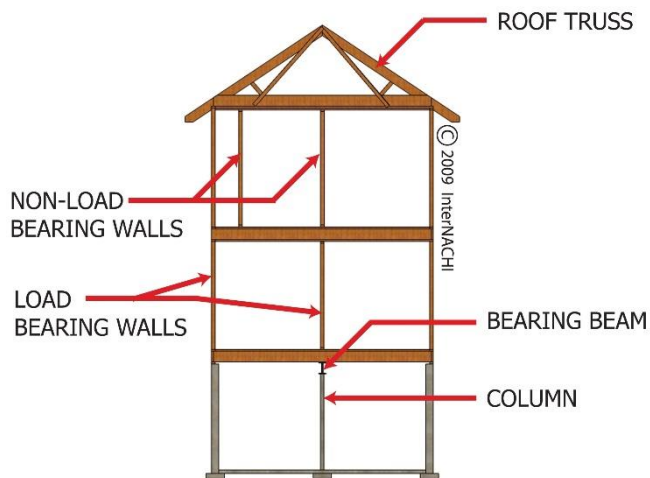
Load and non-load bearing walls (nachi.org, 2009)
